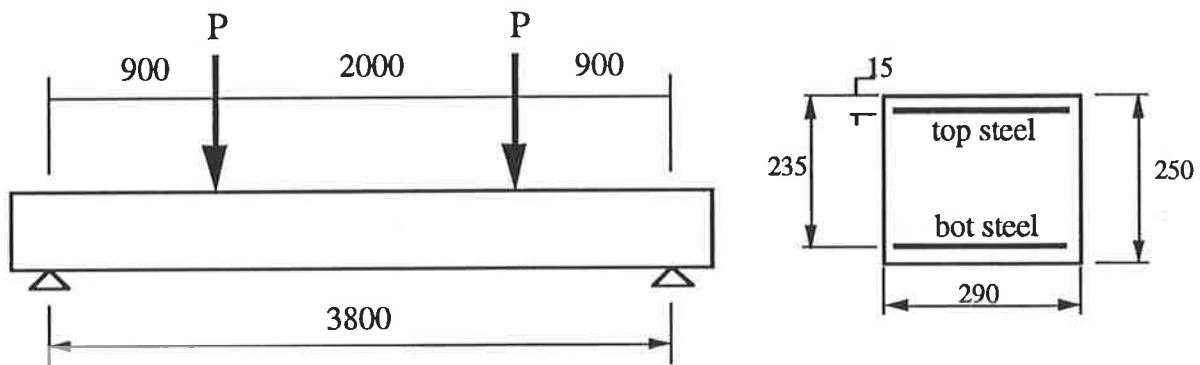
Test set-up and section details for beams tested by Monnier (1970)
